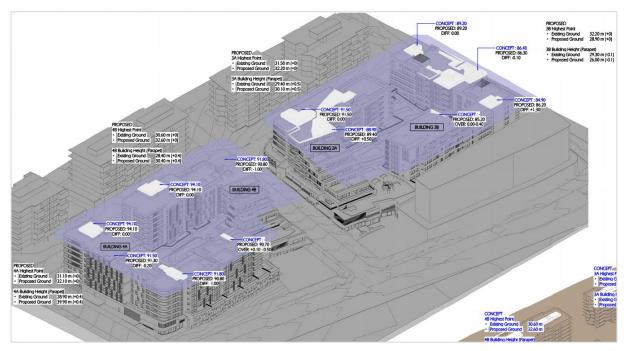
Height Plane Diagram for Buildings 3 and 4 (Source: Zhinar Architects)
